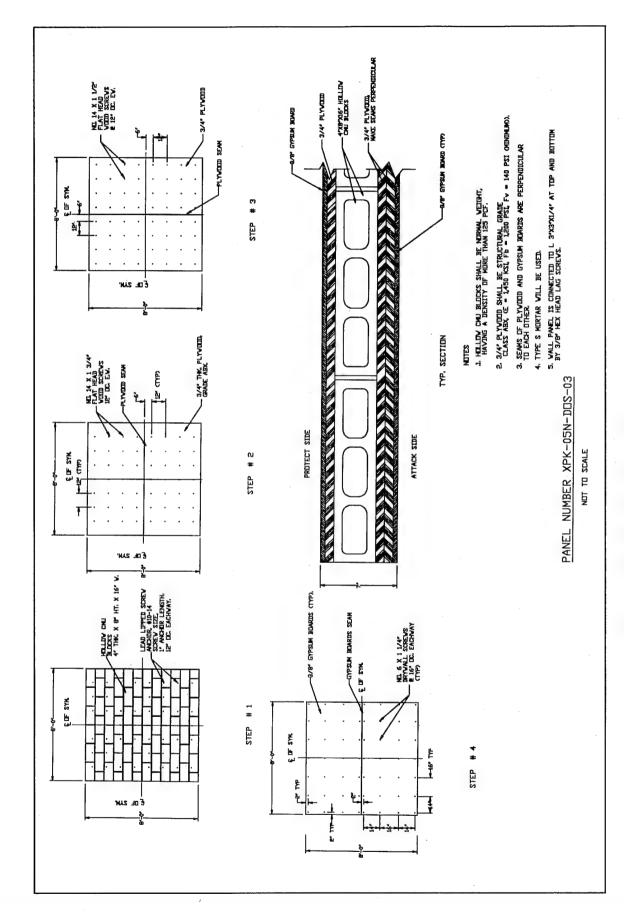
Engineering drawings for wall panel XPK-05N-DOS-03 (non-SI units)
